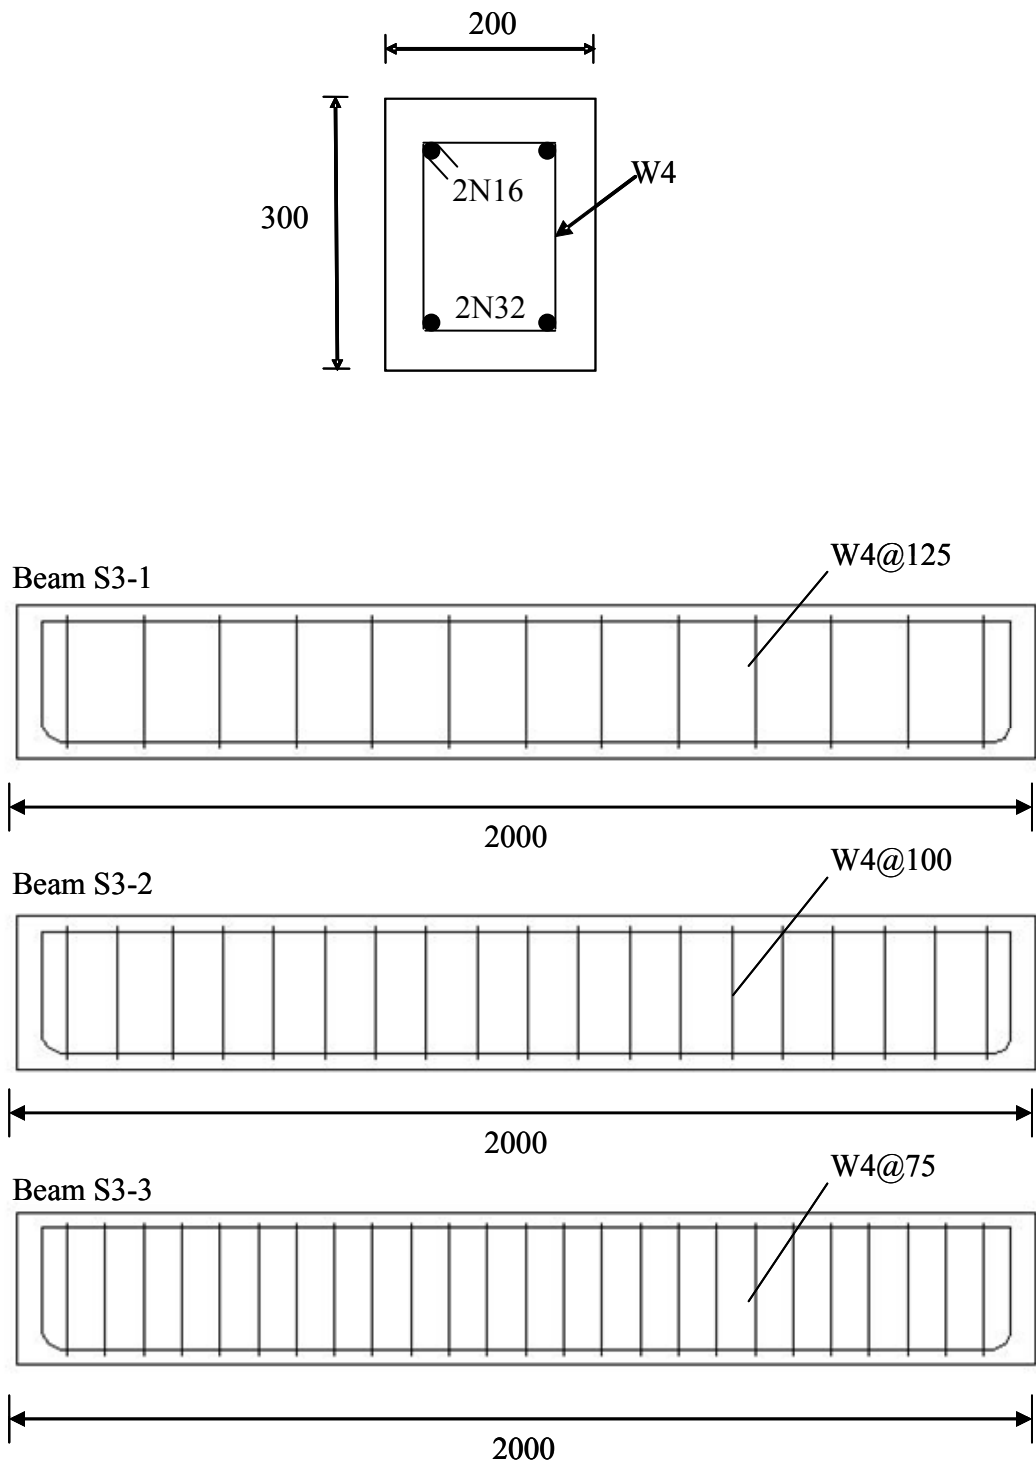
Cross-section and Elevation View of Beams for Series 3
